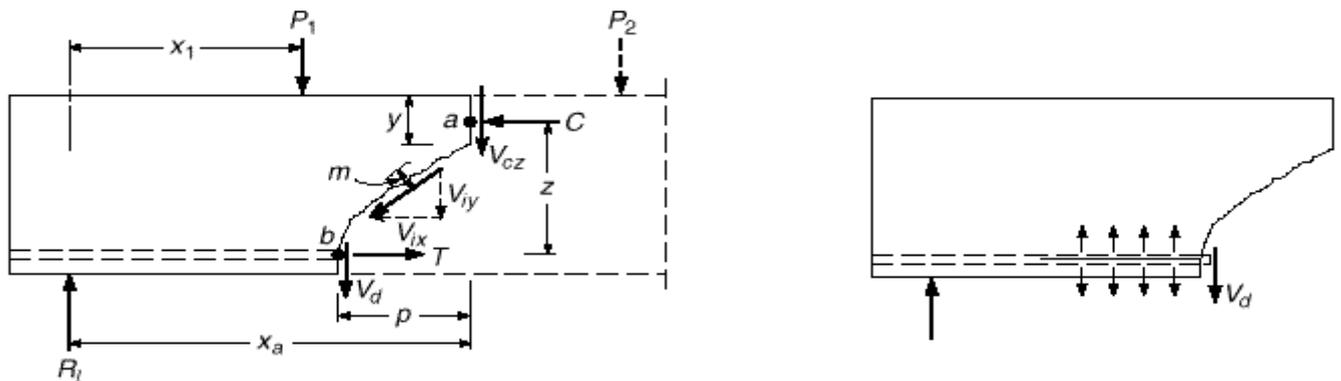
Forces at a diagonal crack in a beam without web reinforcement (Nilson)
